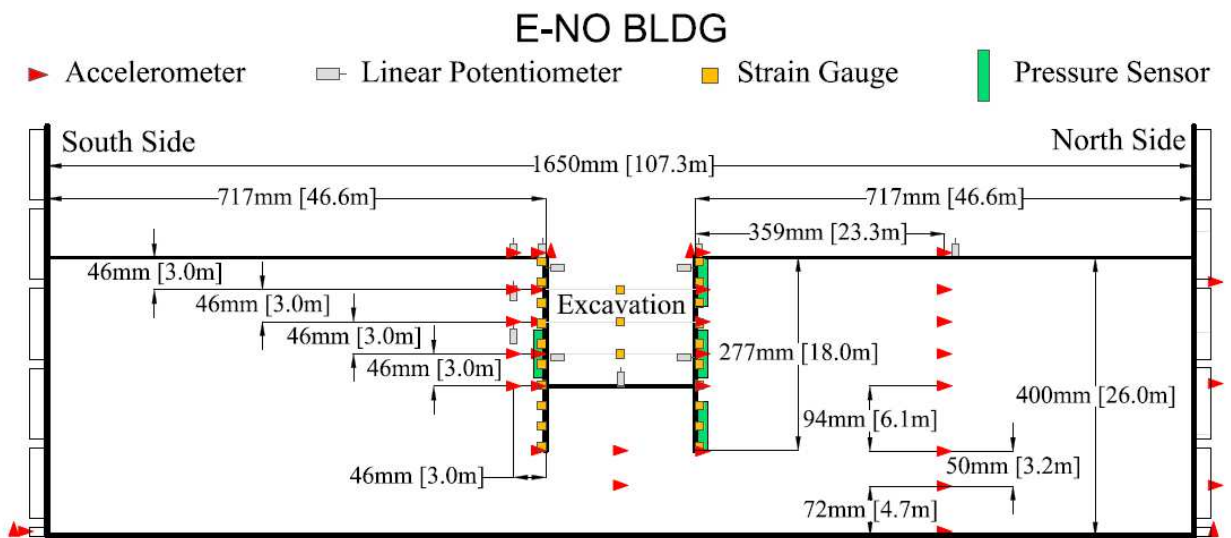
E-No Bldg instrumentation layout shown in elevation view (dimensions shown in model scale).
